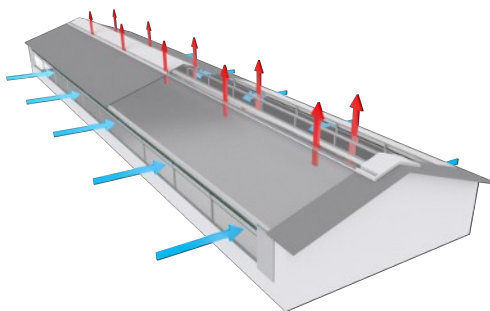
Example of a naturally ventilated livestock house with curtain openings on the sides of the house and ridge opening in the roof
